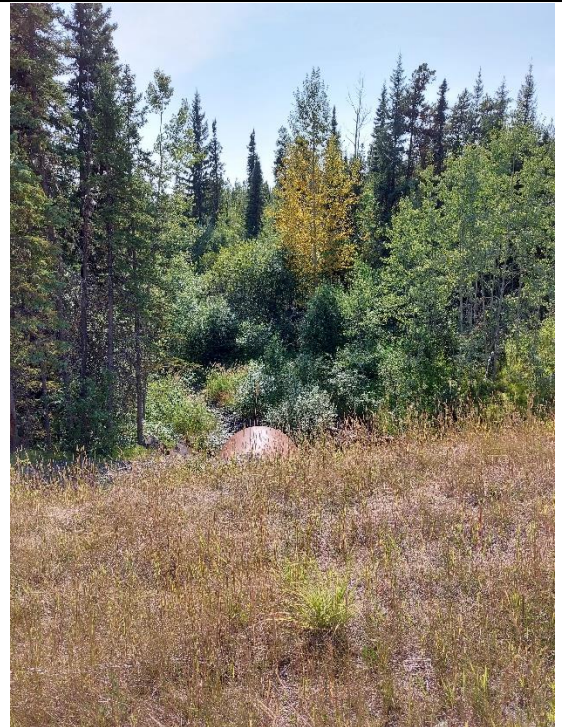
Facing east towards culvert inlet at northern embankment at Highway 16
